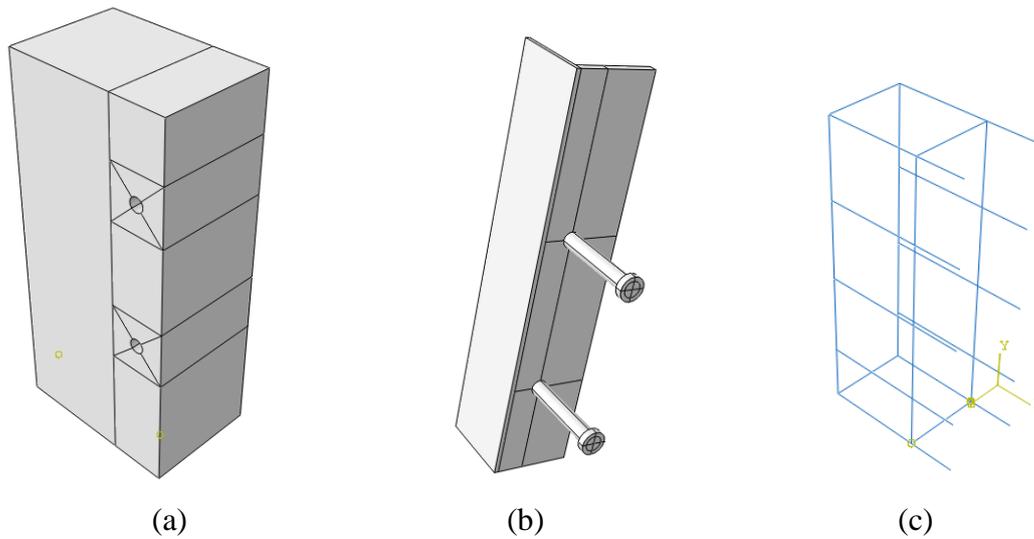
Part created for model (a) concrete (b) Steel beam (c) Rebar
